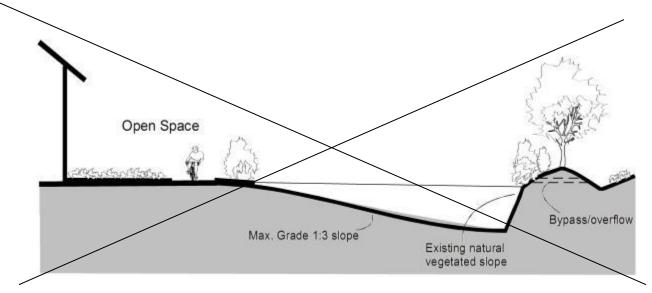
Figure Exception to 20.50.160(A)(2) and (3): Example of stormwater facility design which does not require fencing.
